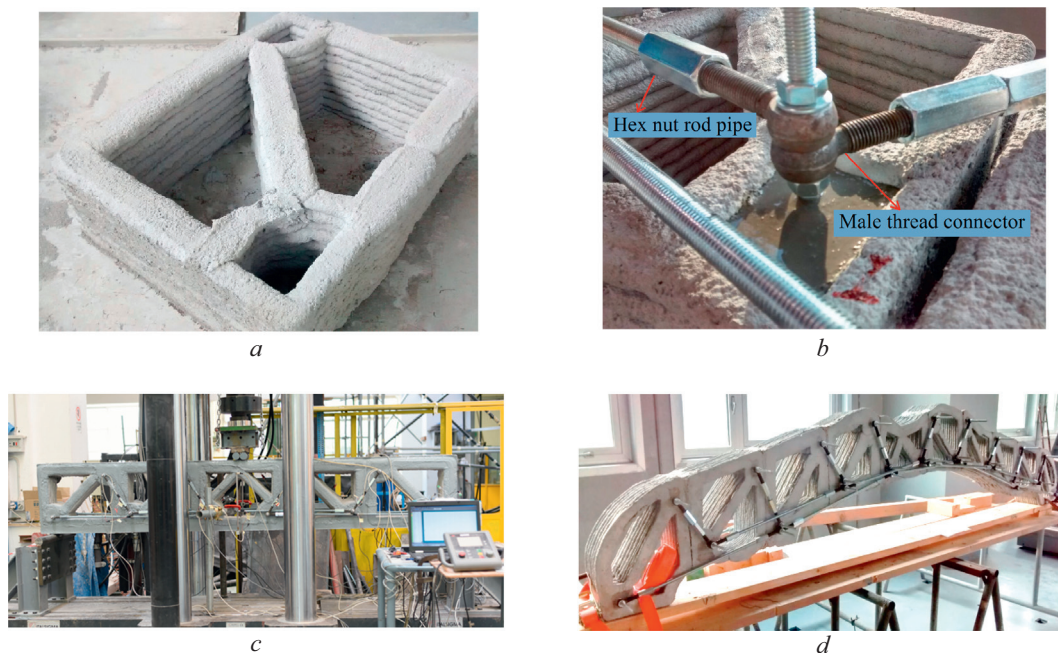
External reinforcement arrangement approach [26]: (a) concrete 3D printed segment; (b) external steel reinforcement connection details; (c) straight and (d) variable cross-section RC beams obtained through the DFC technique of external reinforcement arrangement.
